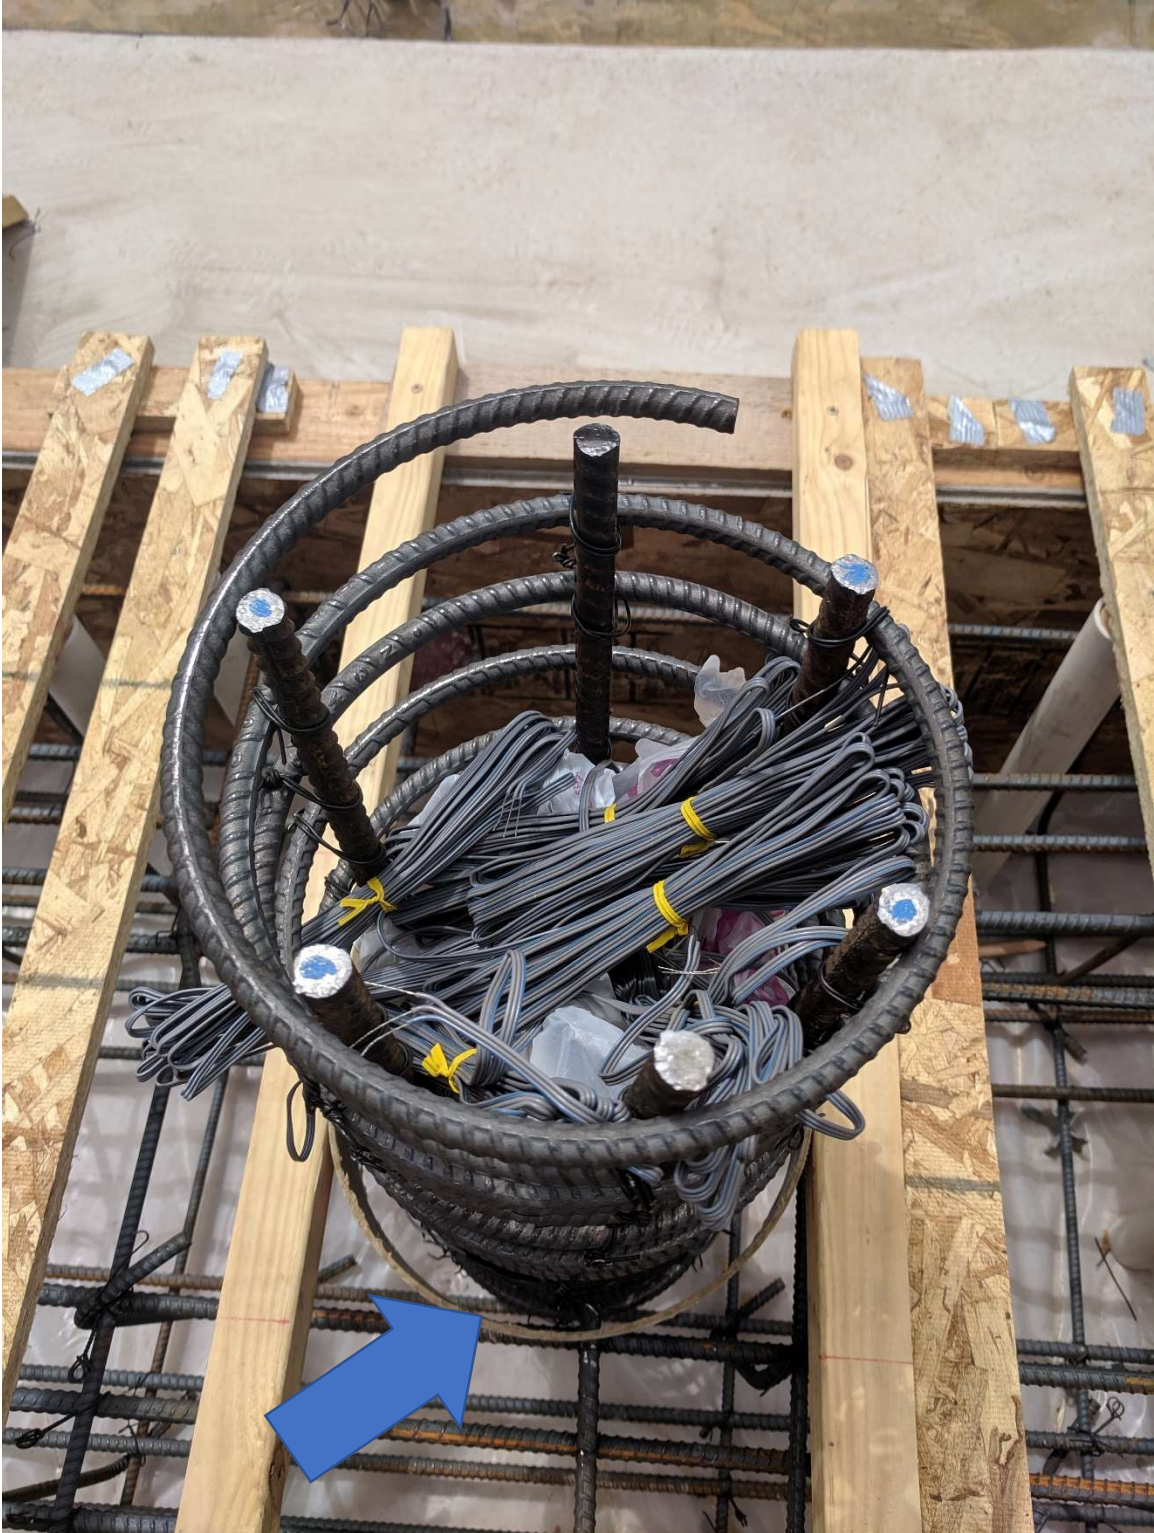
Clearance between hinge reinforcement cage and footing reinforcement
